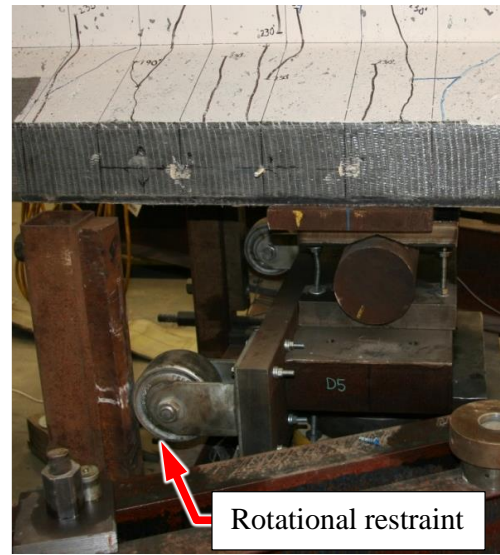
Photo. Test setup on girder test C8D with concrete crushing along the web.
